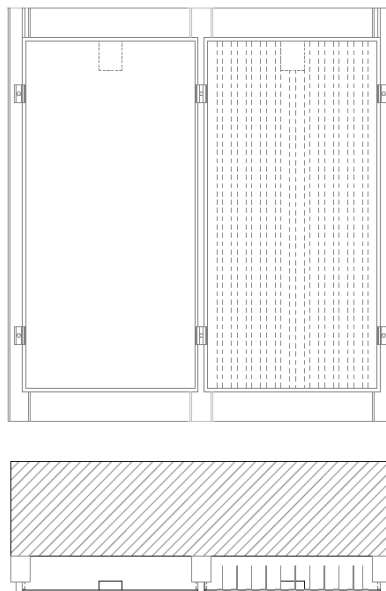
frontal view and horizontal section of the specimen (see annex A for further details)
